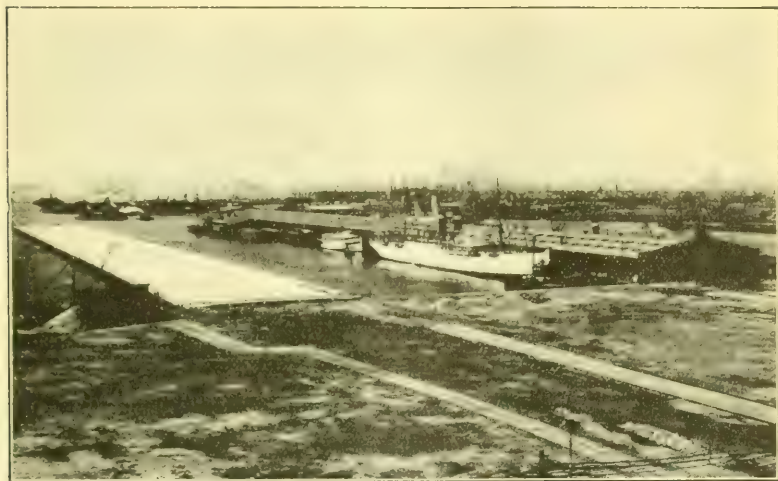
TWO PIERS WITH REINFORCED CONCRETE DECK, EACH 150 FT. WIDE.
